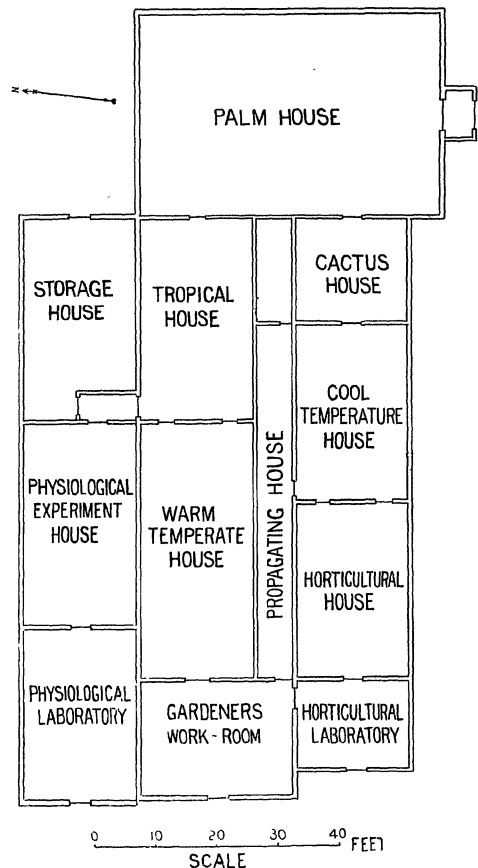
Ground-Plan of the Lyman Plant House at Smith College.
